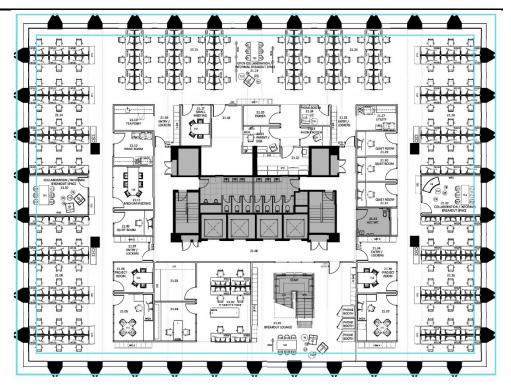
FLOOR PLAN FOR LEVEL 21 WHICH SHOWS THE EXTENSIVE WINDOW AREA (HIGHLIGHTED IN BLUE) AROUND THE OFFICE SPACE
